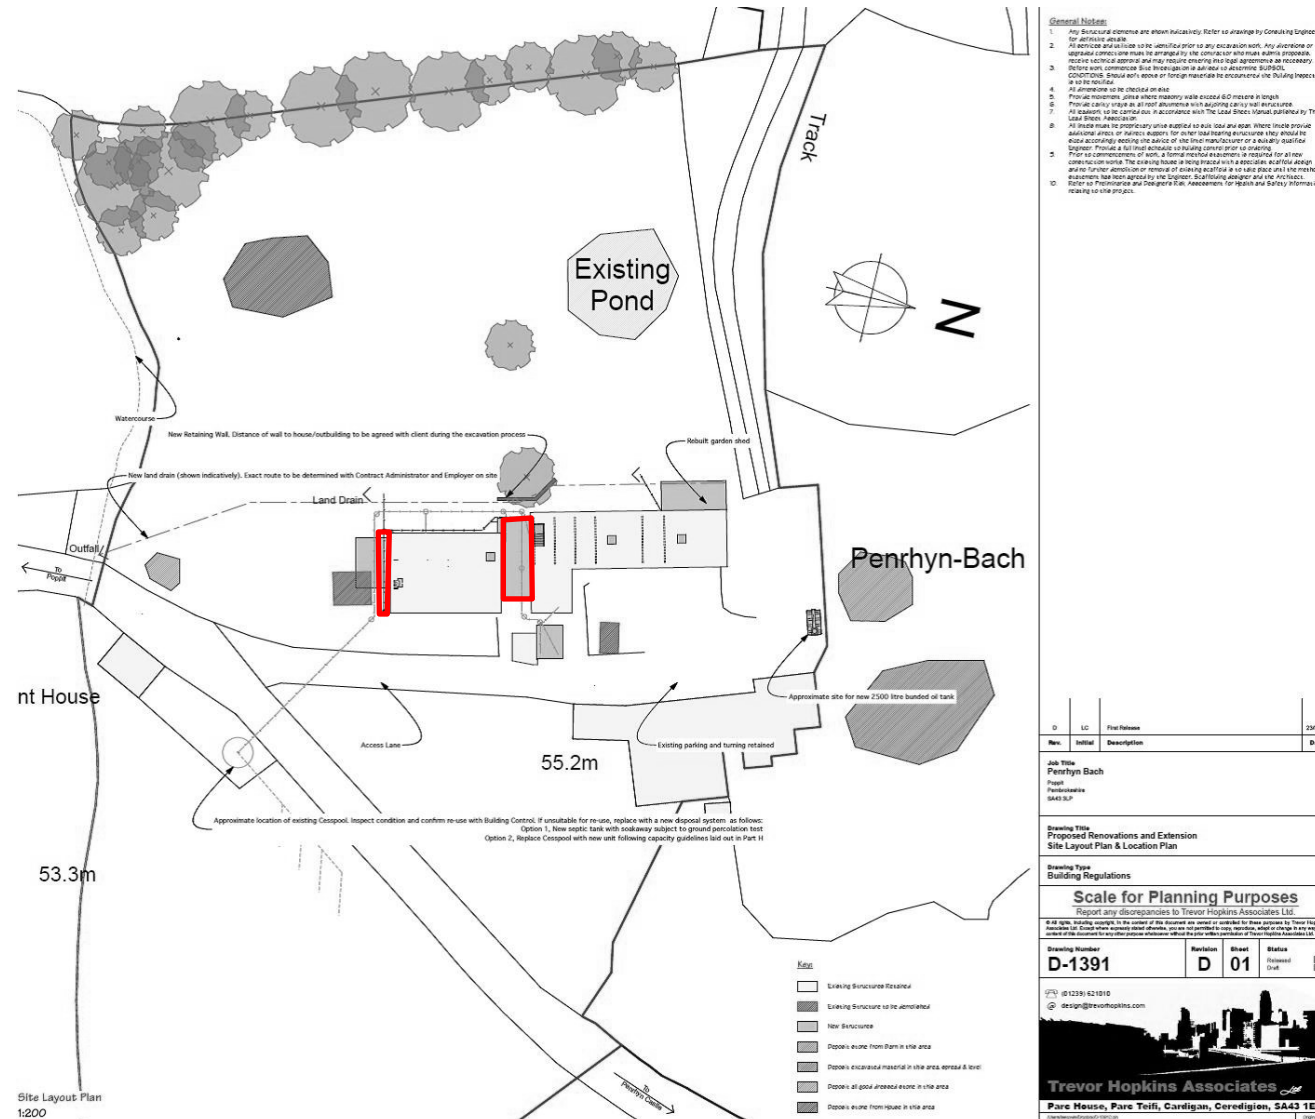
Basic location plan of development proposals for Penrhyn Bach, Poppit showing the extension and gable end wall to be rebuilt outlined in red (Plan supplied by Trevor Hopkins Associates)
